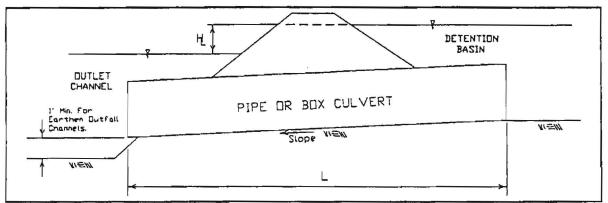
Typical Pipe or Box Culvert Outlet Structure
